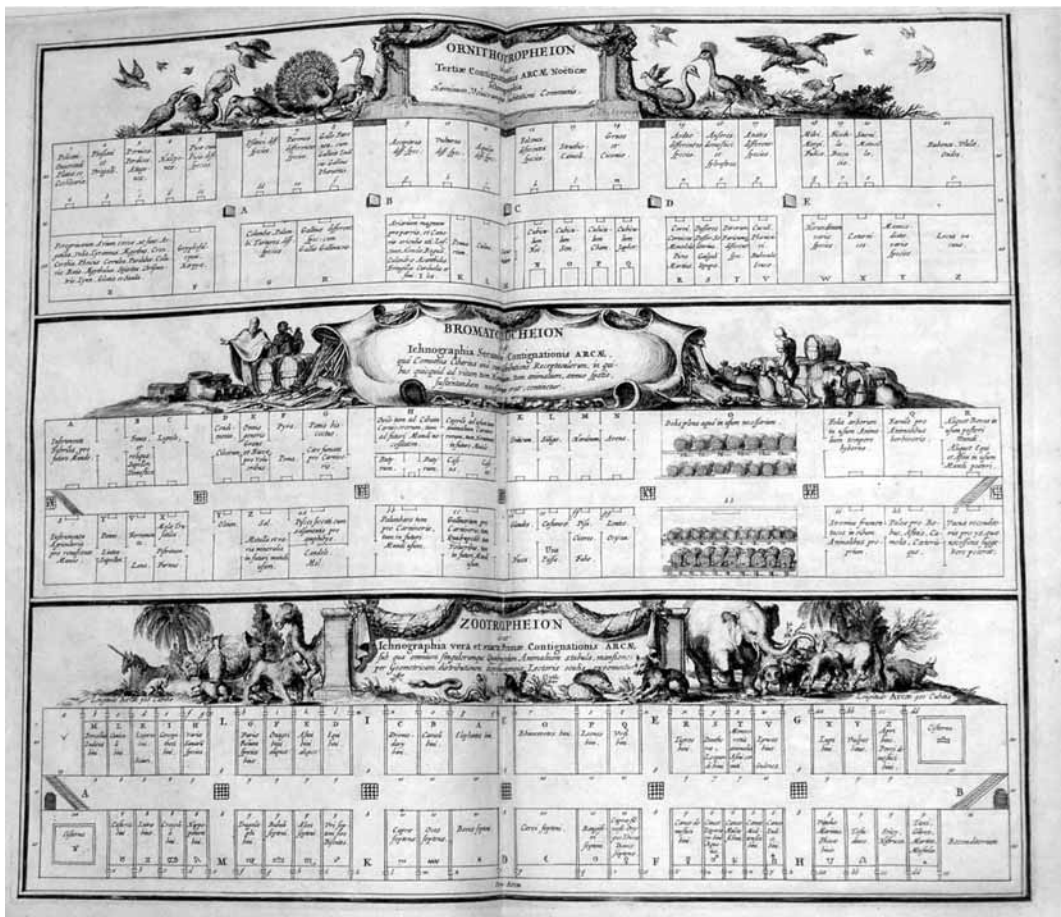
Floor plan for the Ark. (Kircher 1675)
